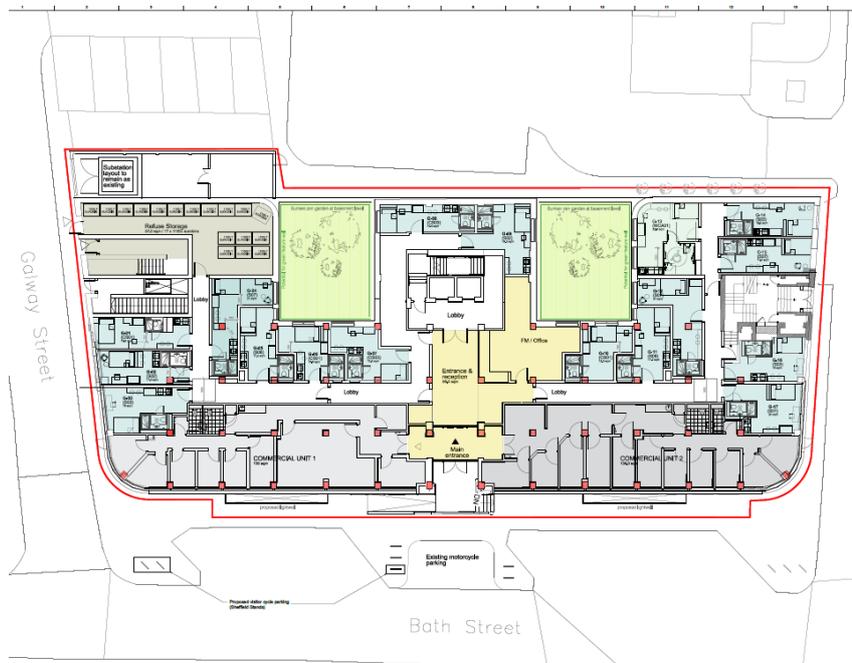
Proposed ground floor layout showing landscaping at the rear (accessed at lower ground floor level).
